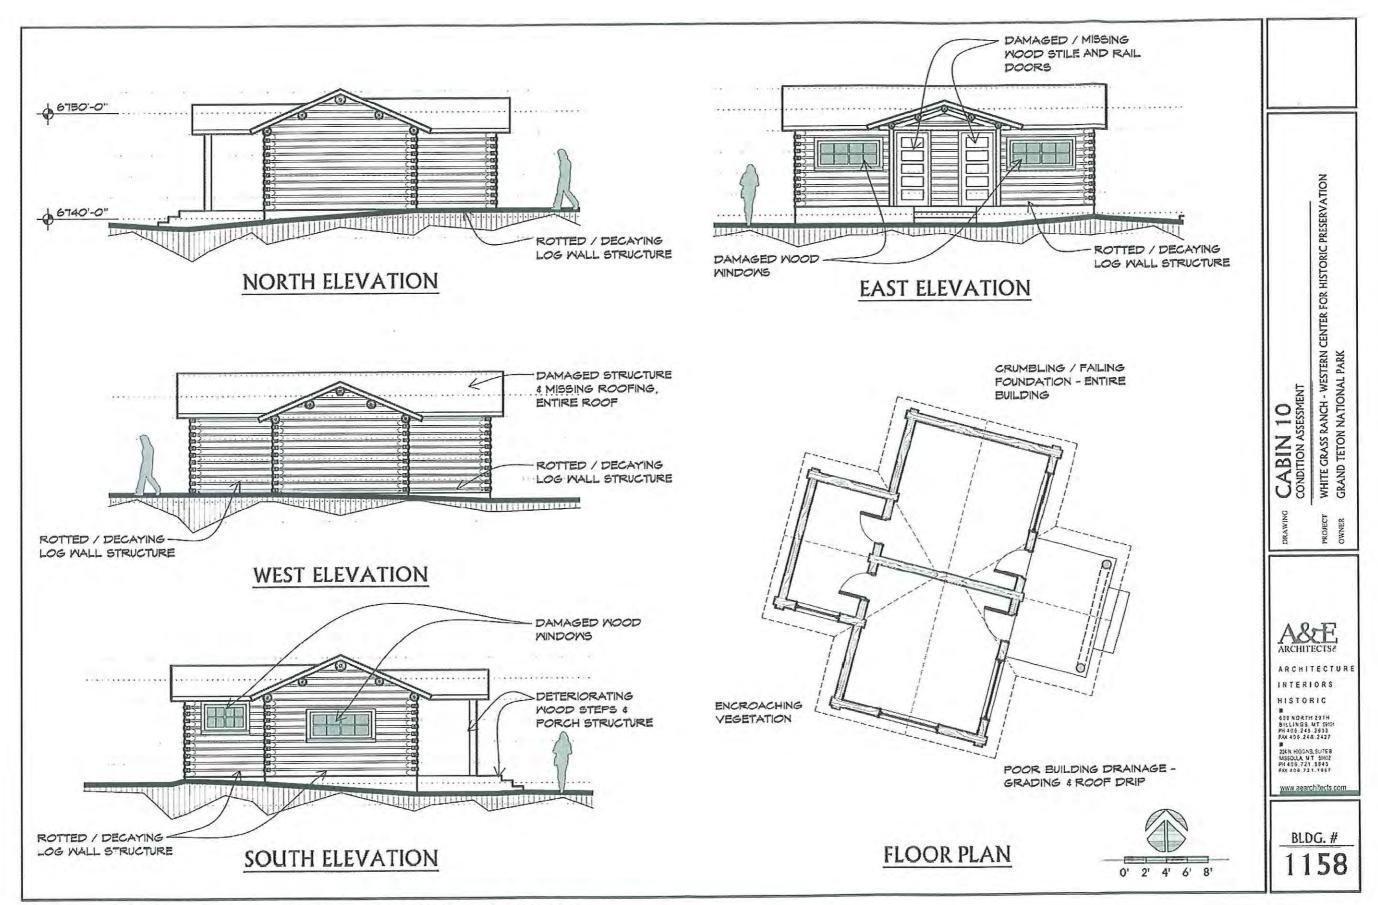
Existing conditions plan and elevations for HS-1158, Cabin 10 (A&E: 2006).
